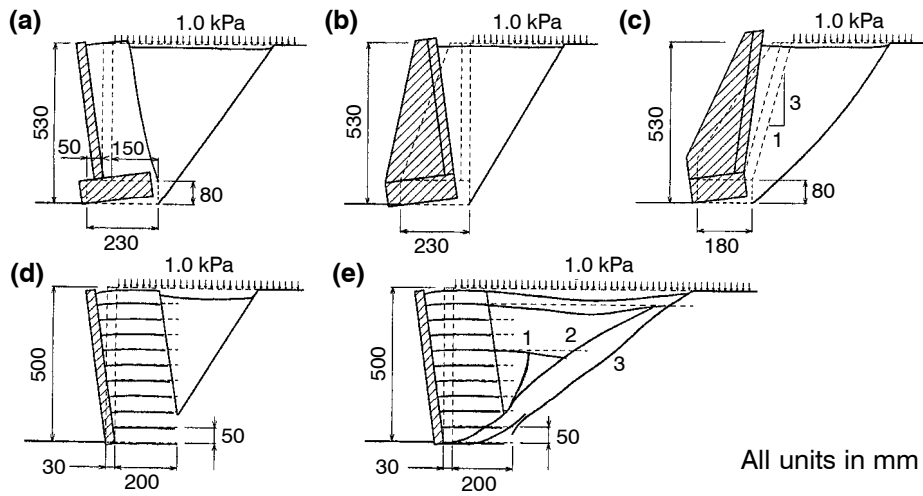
Initial and displaced locations and observed failure planes in the model retaining walls: (a) cantilever-type; (b) gravity-type; (c) leaning-type; (d) reinforced soil, Type 1; (e) reinforced soil, Type 2.
